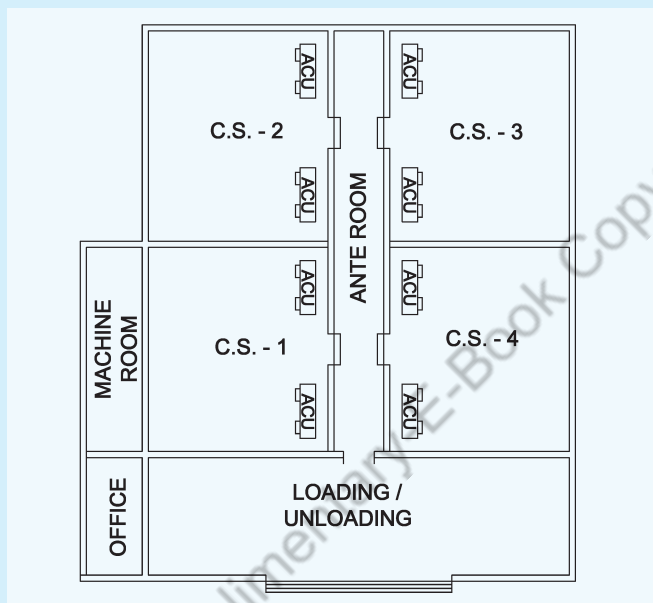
Typical plan of a multi floor - multipurpose cold store
